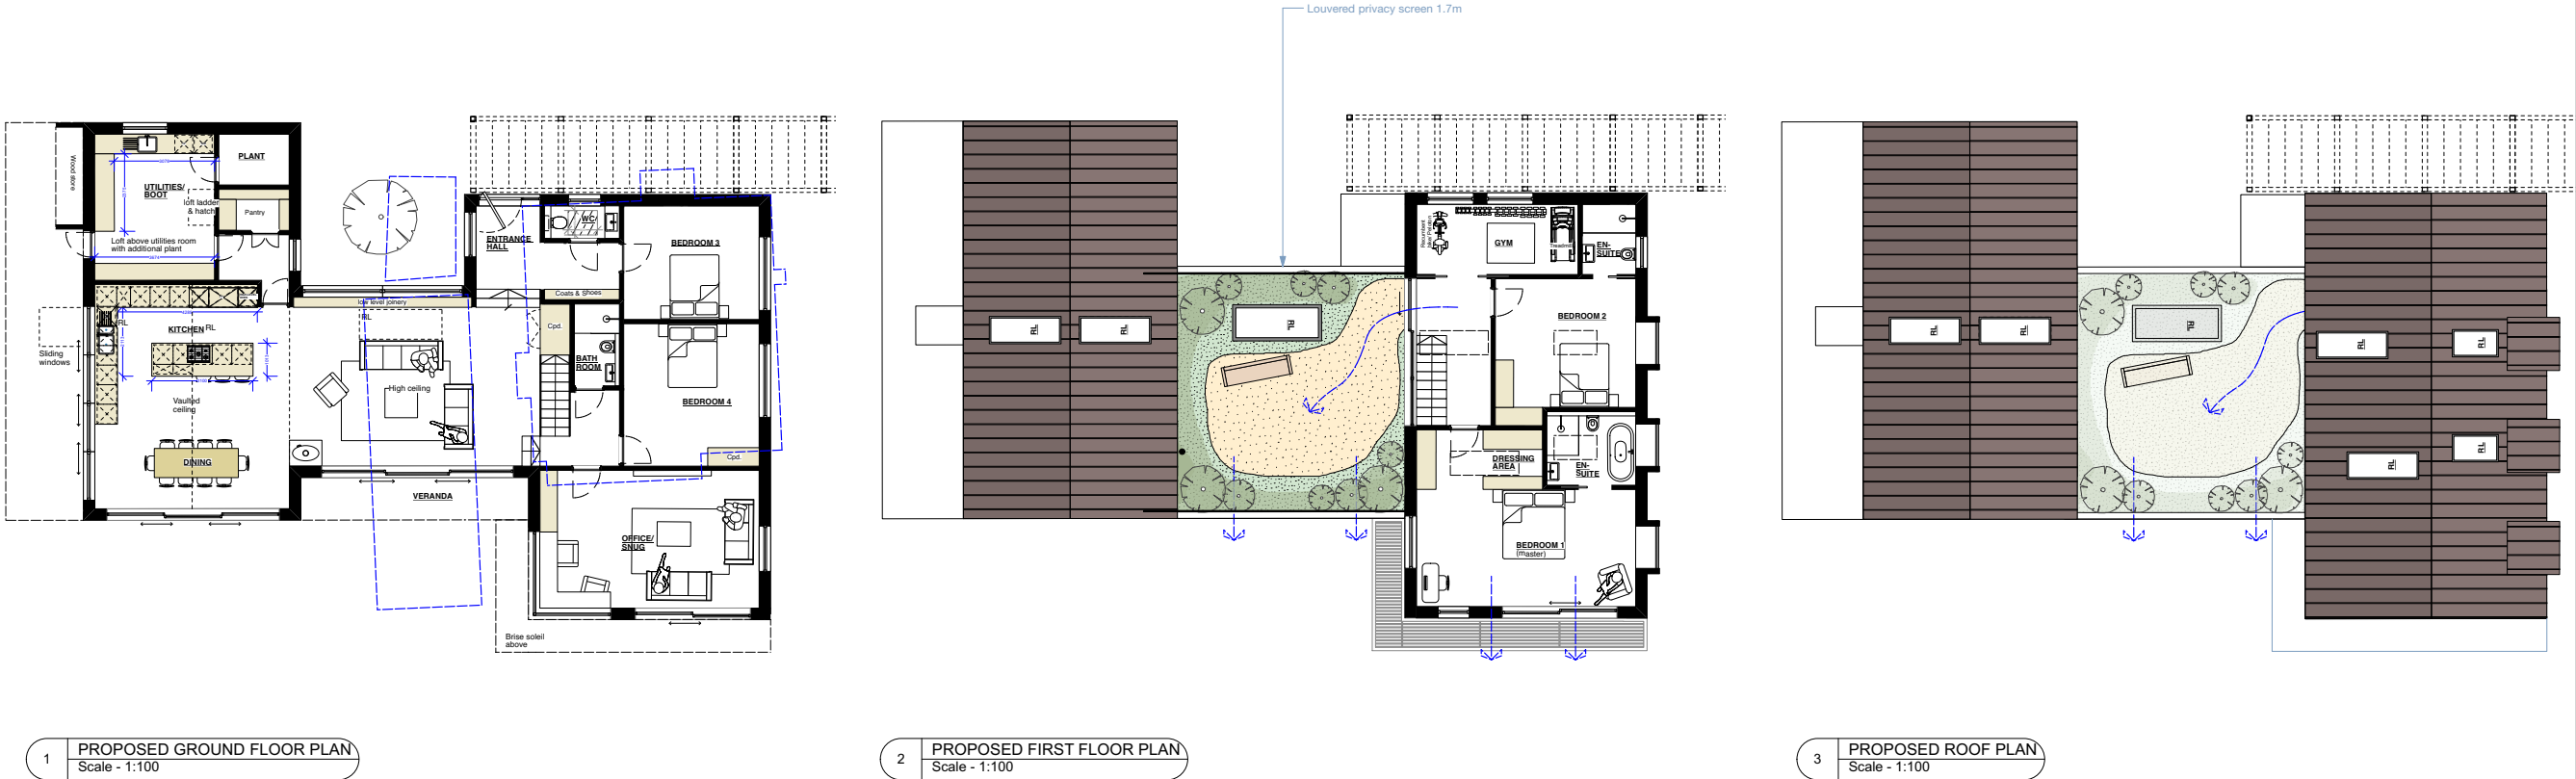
Proposed Landscape Plan Drawing No. 0335-100, by HAPA Architects
